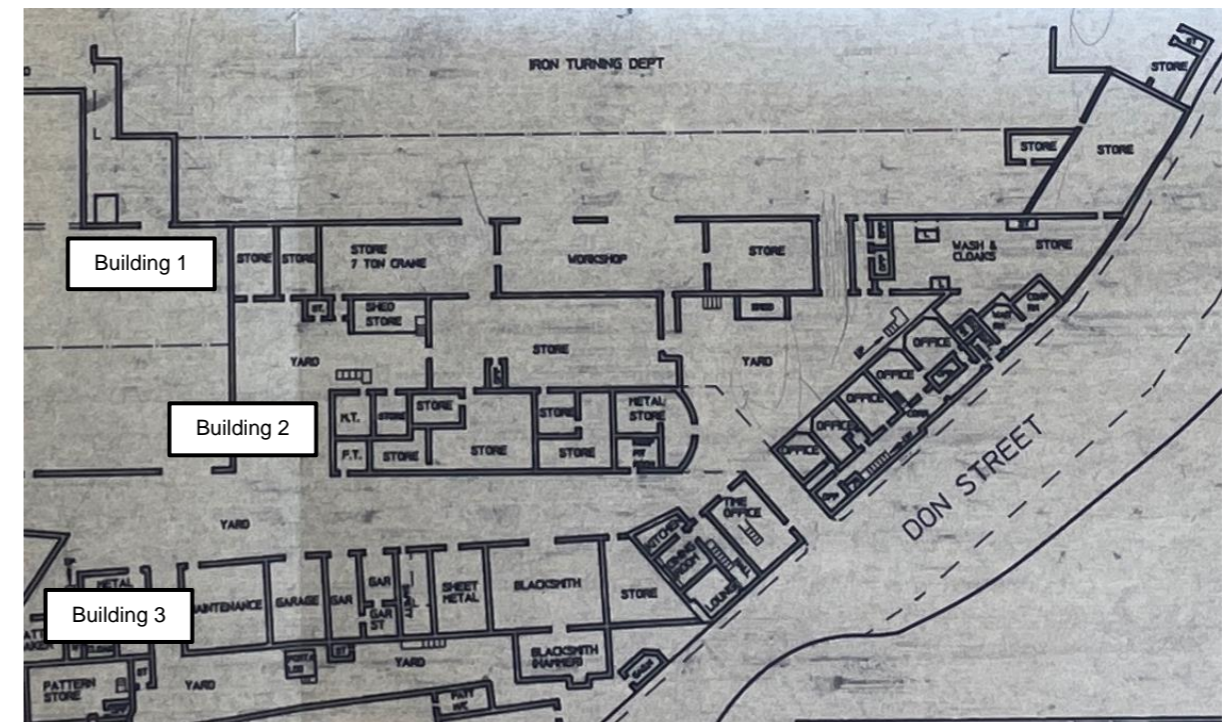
Extract of ground floor plan, 1991. Full plan provided below. Indicated uses at ground floor as follows: Building 1 - store (incl. 7-ton crane), workshop, store, gap over alleyway, wash and clocks, Building 2, store, including metal store, Building 3 - maintenance, garages, blacksmith store.
